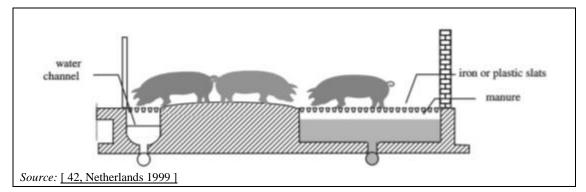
Partly slatted floor with a shallow manure pit and a water channel for spoiled drinking water in combination with a convex floor
